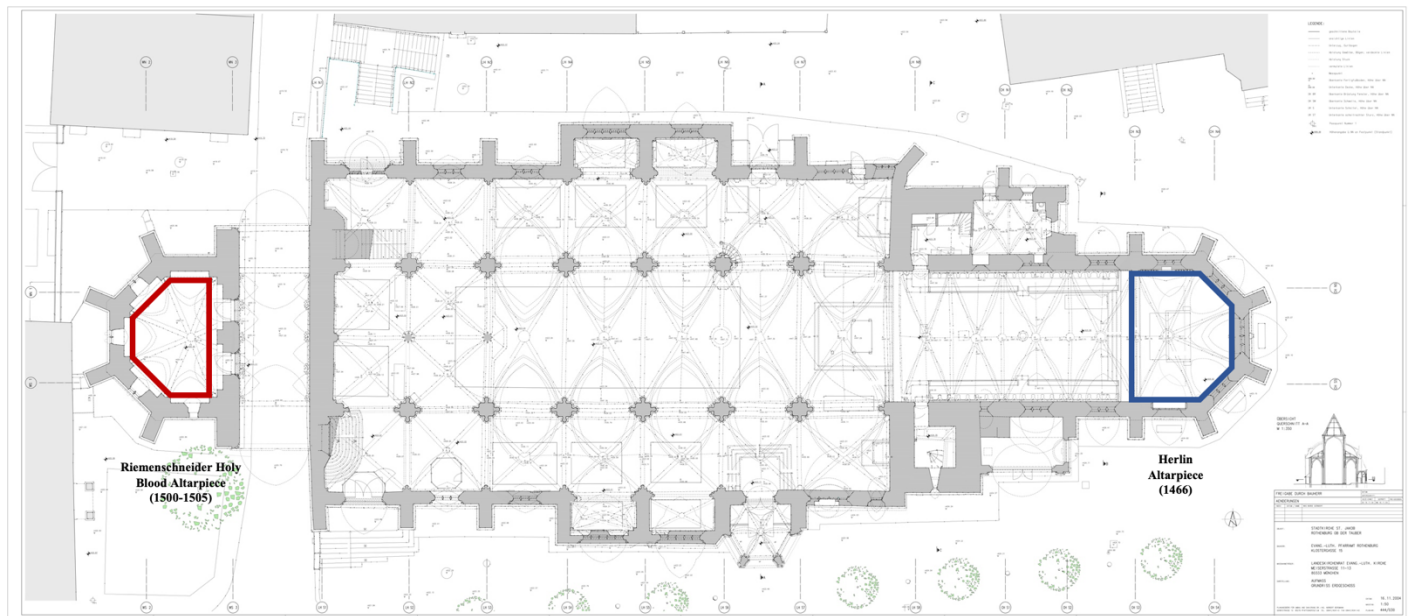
Floorplan of St. James Church, rendering by Büro Bergmann GmbH Architekten – Bauingenieure, additions marking each chapel space by the author.
